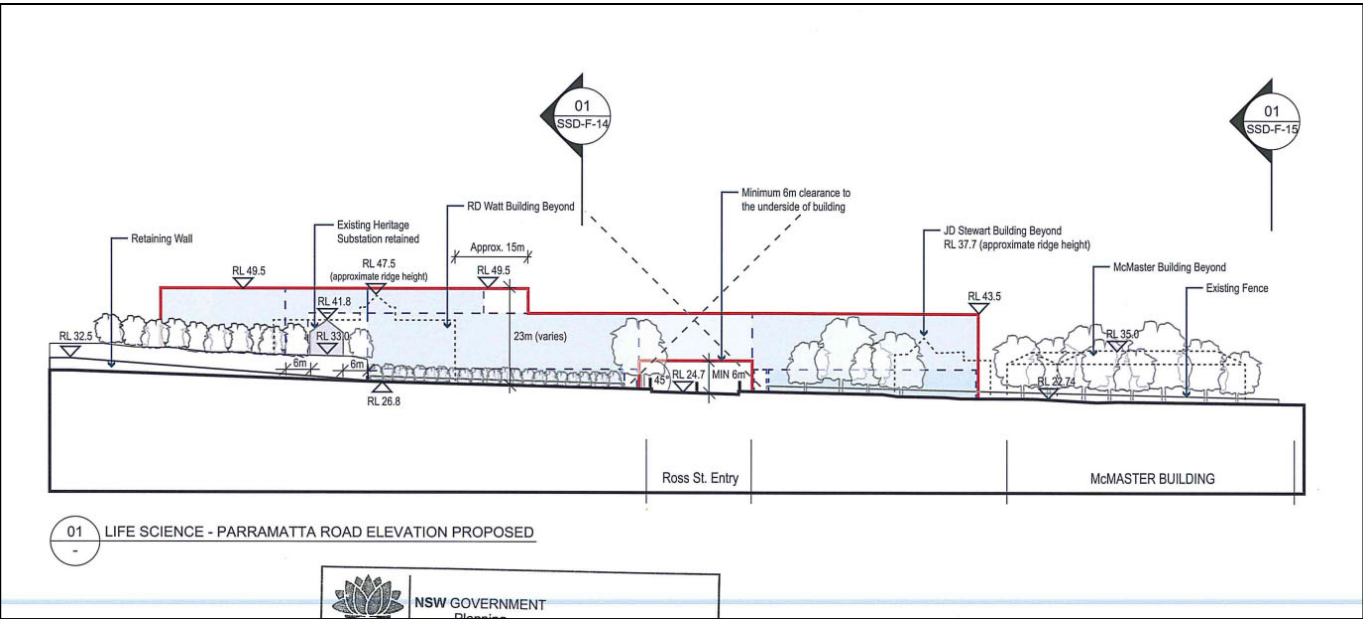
| CIP – approved Life Science building envelope – Parramatta Road elevation (Source: SSD-6123)
